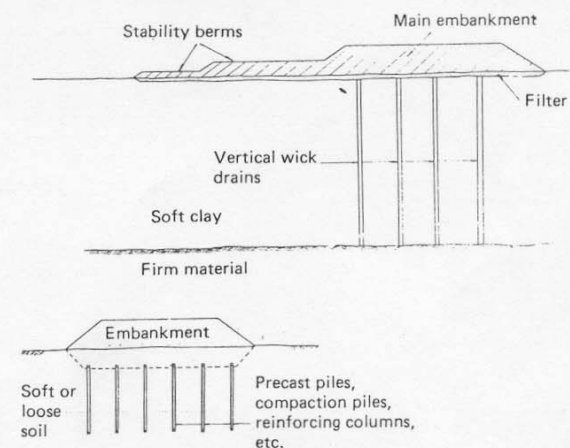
Ground improvement possibilities for embankments on soft soils
